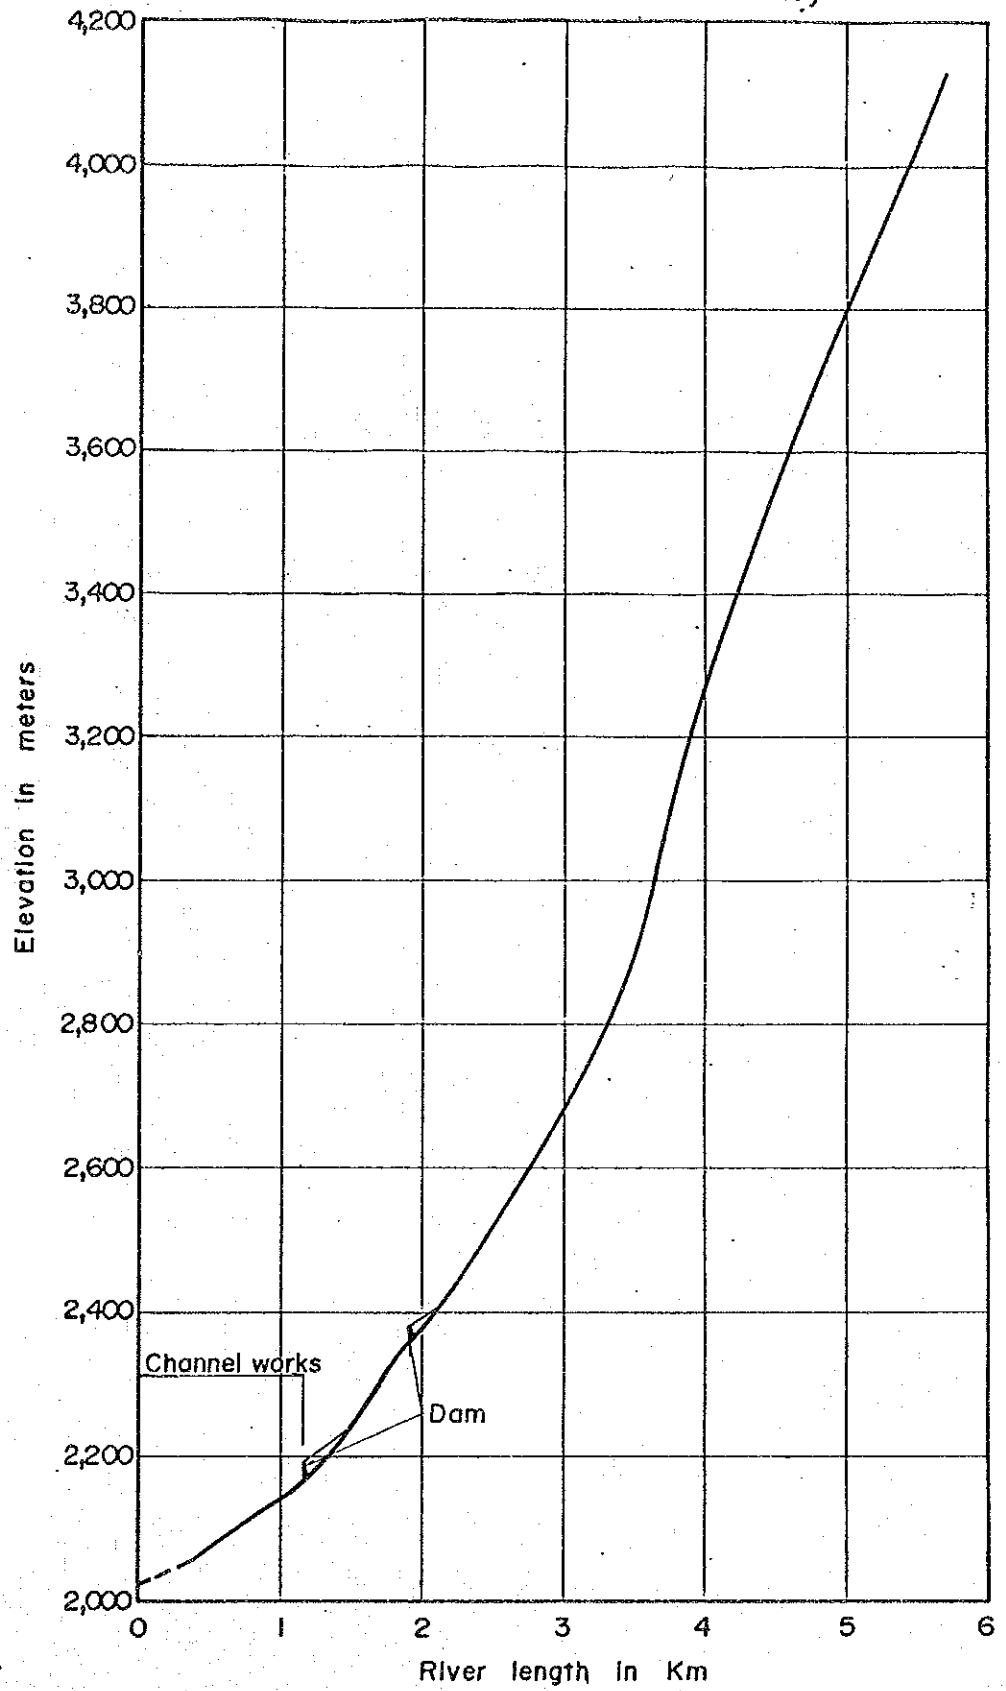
Structural Plan on Profile of Qda Cuchimachay (R25)
